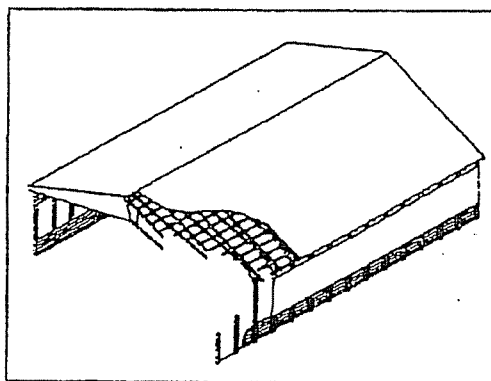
An ideal dry stack storage facility is a roofed structure with an earthen or concrete floor.
